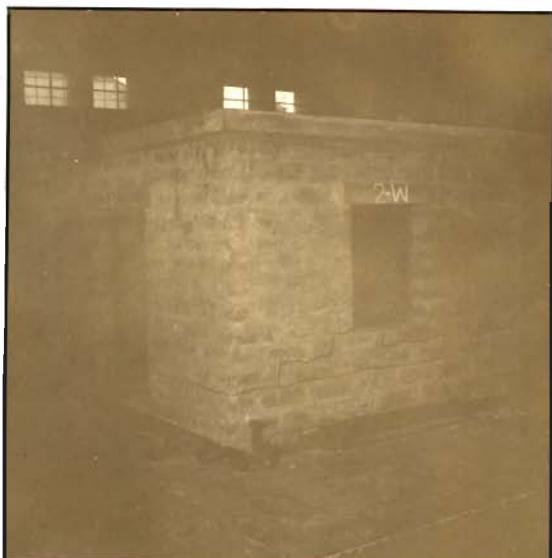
NORTH AND WEST WALLS OF MODEL NO. 2 WITH FIXED BASE CRACKED
